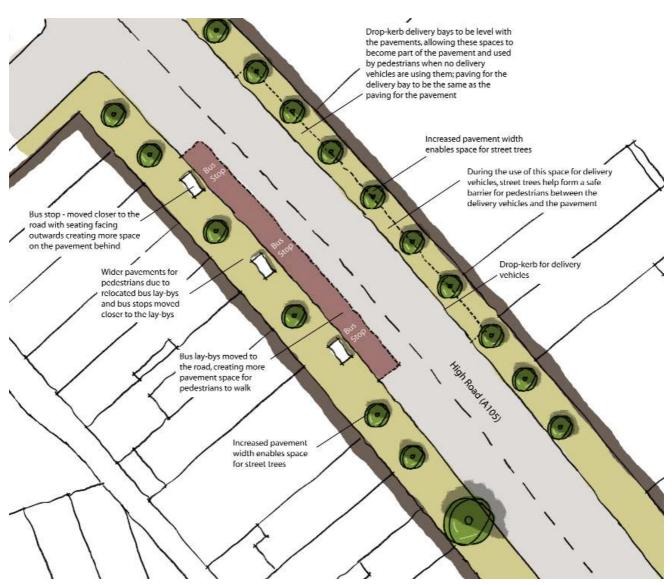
Indicative Plan for Bus Stops and Loading Bays
